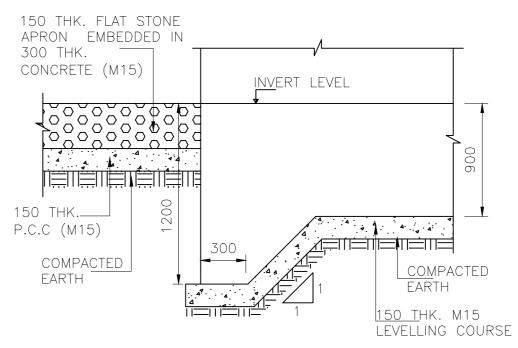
# DETAIL OF CURTAIN WALL-I (DOWN STREAM SIDE)
